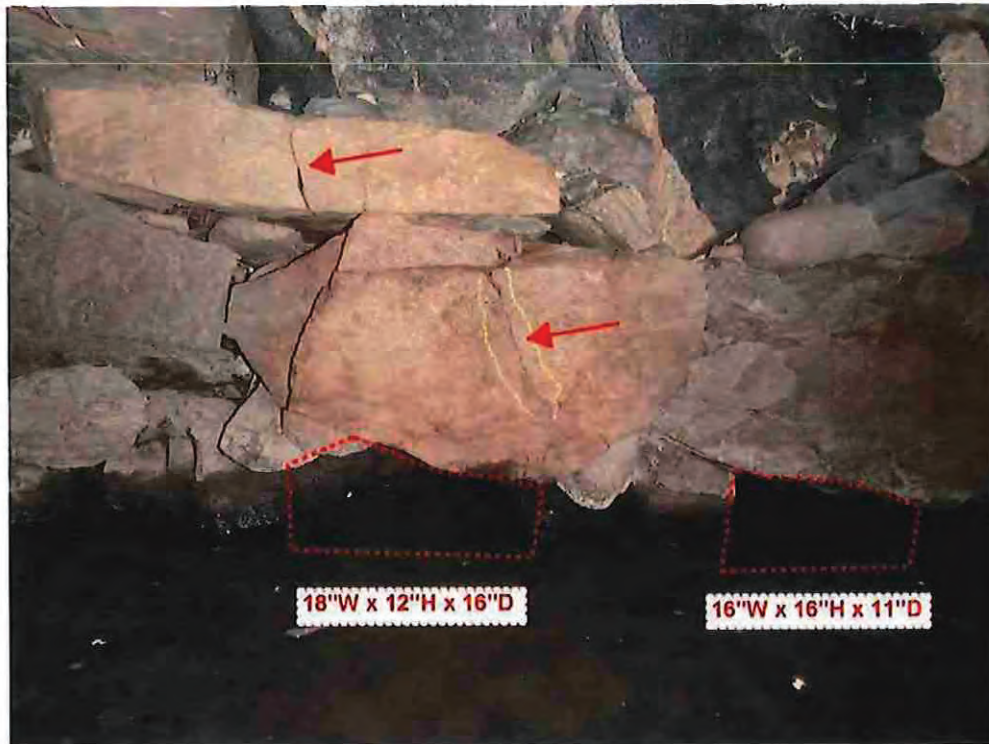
Breastwall - South breastwall at west end, area of voids due to missing stones between and below drain pipes.
